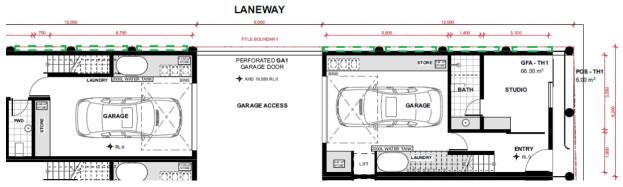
Urban Design mark-up of ground floor plan showing indicative landscaping along the laneway (in green)
